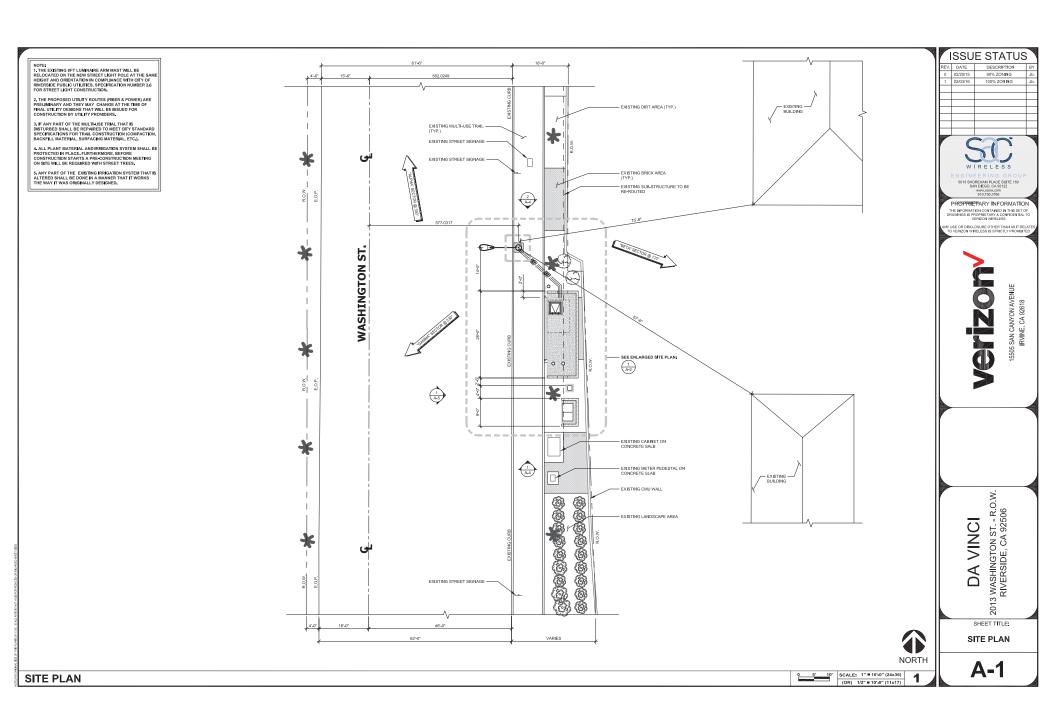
P15-0896 & P15-1040, Project Plans
